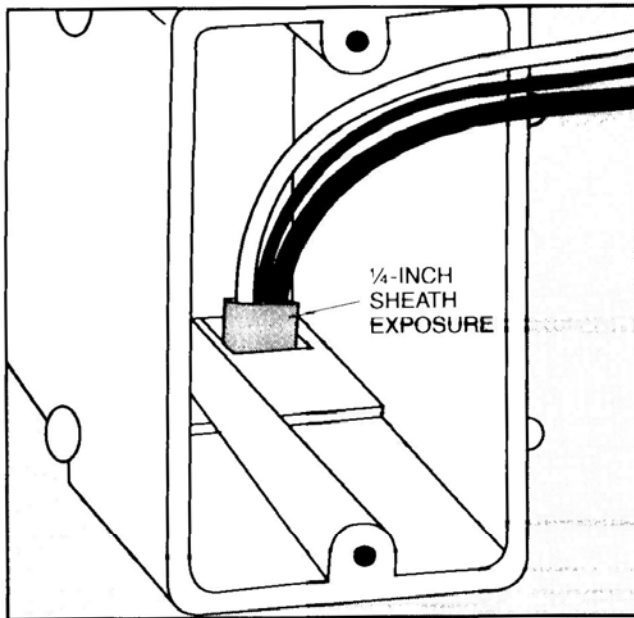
E-1. Cable clamps and cable connectors are not required to secure cable in nonmetallic boxes. The cable protective sheathing should extend up to 1/4-inch inside the box.
